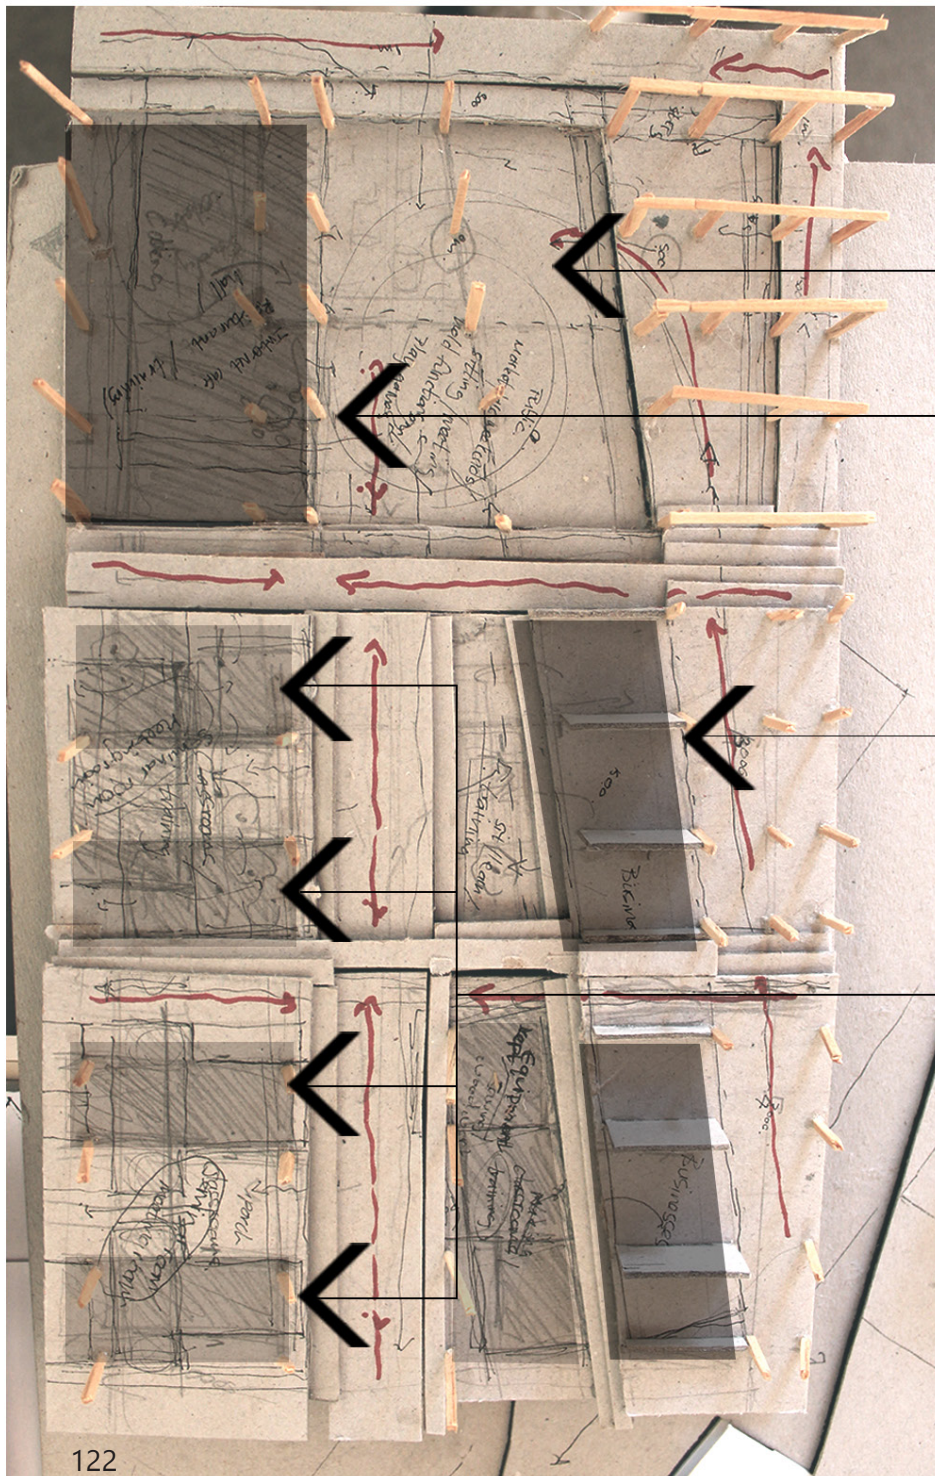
Sketches of proposal 1, Author (April 2016)
